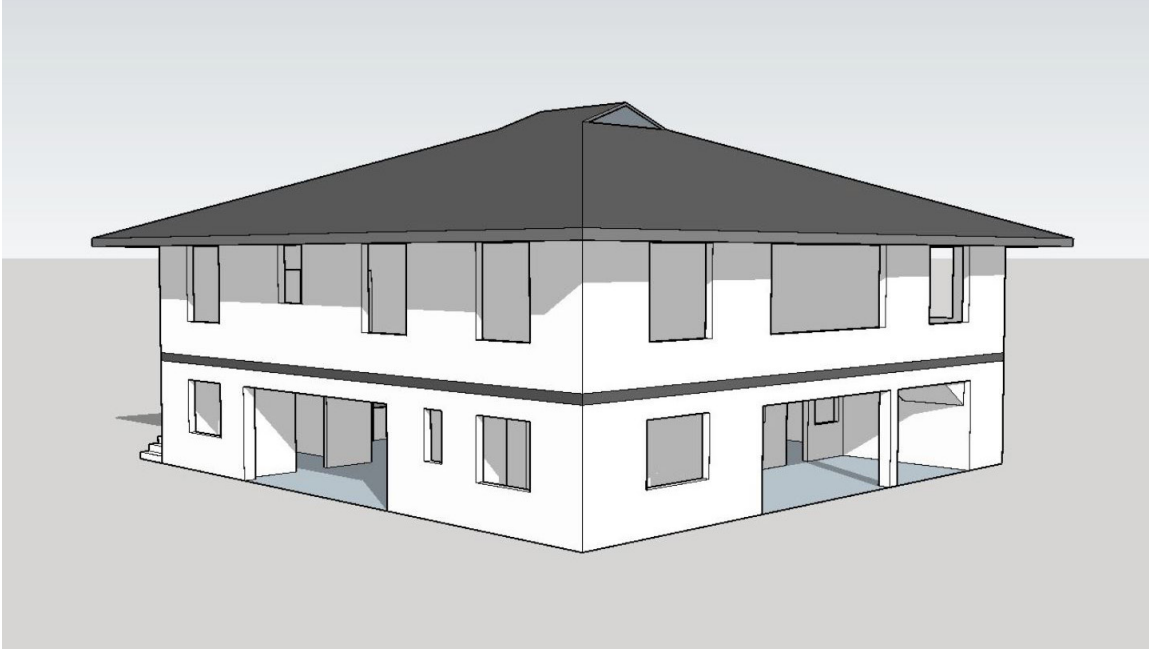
Panama House Type II, Perspective Looking Southwest. Screenshot in SketchUp by author.
